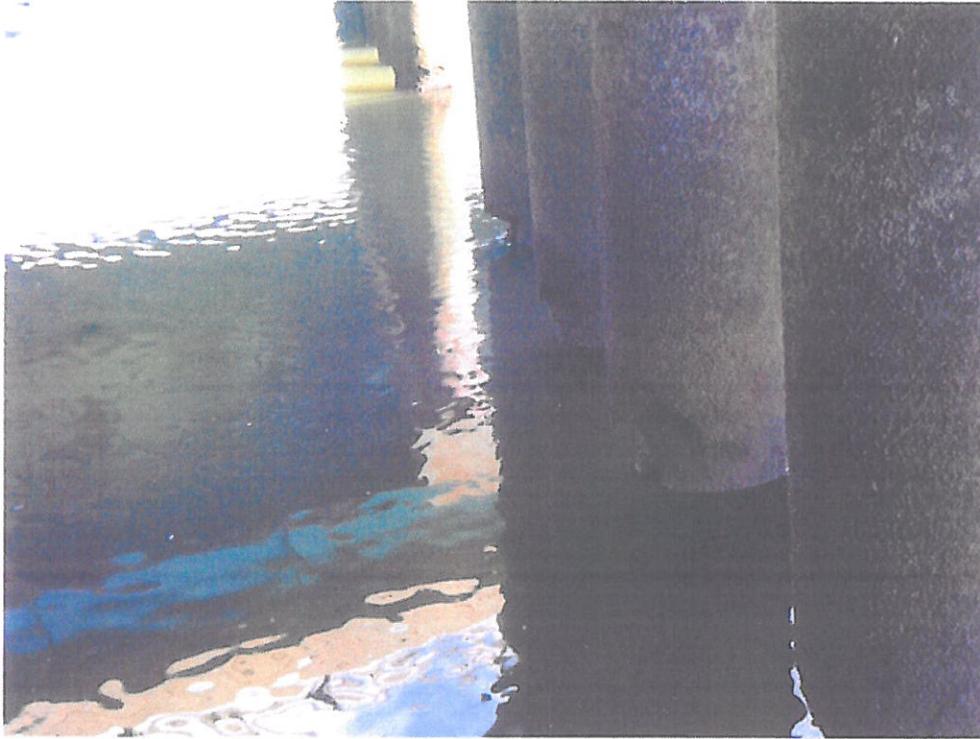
Column 2, South Face, Pier 2 - Advanced corrosion and section loss of steel shell.
